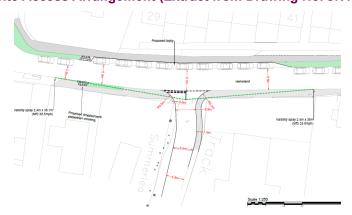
Site Access Arrangement (Extract from Drawing No. JNY10084/03A)
